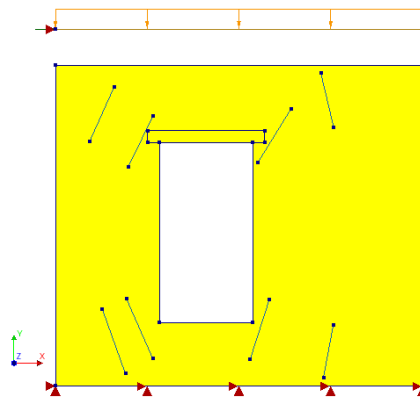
Diagonal anchor (longer length, 540 mm) layout
